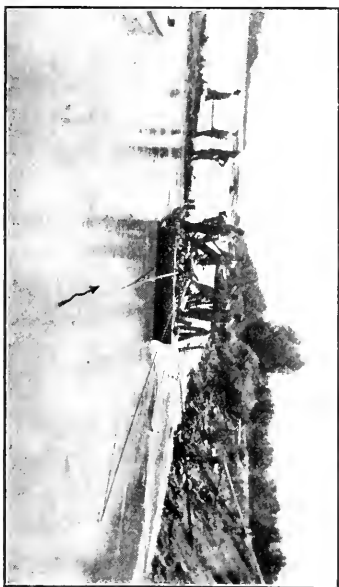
CLOSING FINAL OPENING, HYDRAULIC-FILL DAM, HANLON HEADING, SEPTEMBER 11TH, 1915.
